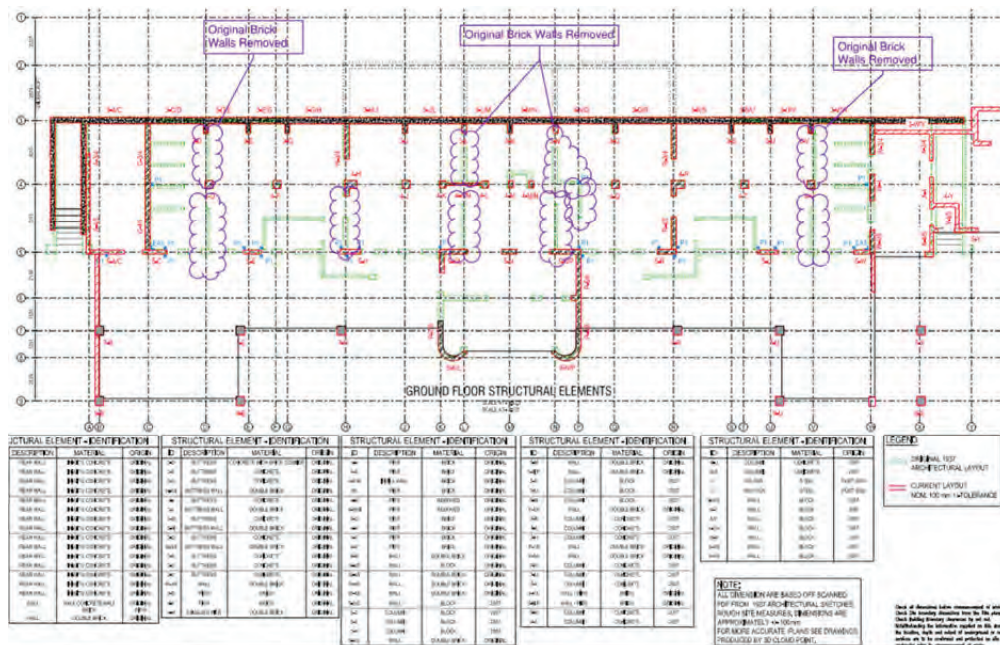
Removed perpendicular original walls clouded in purple. (see appendix for full size drawing)
